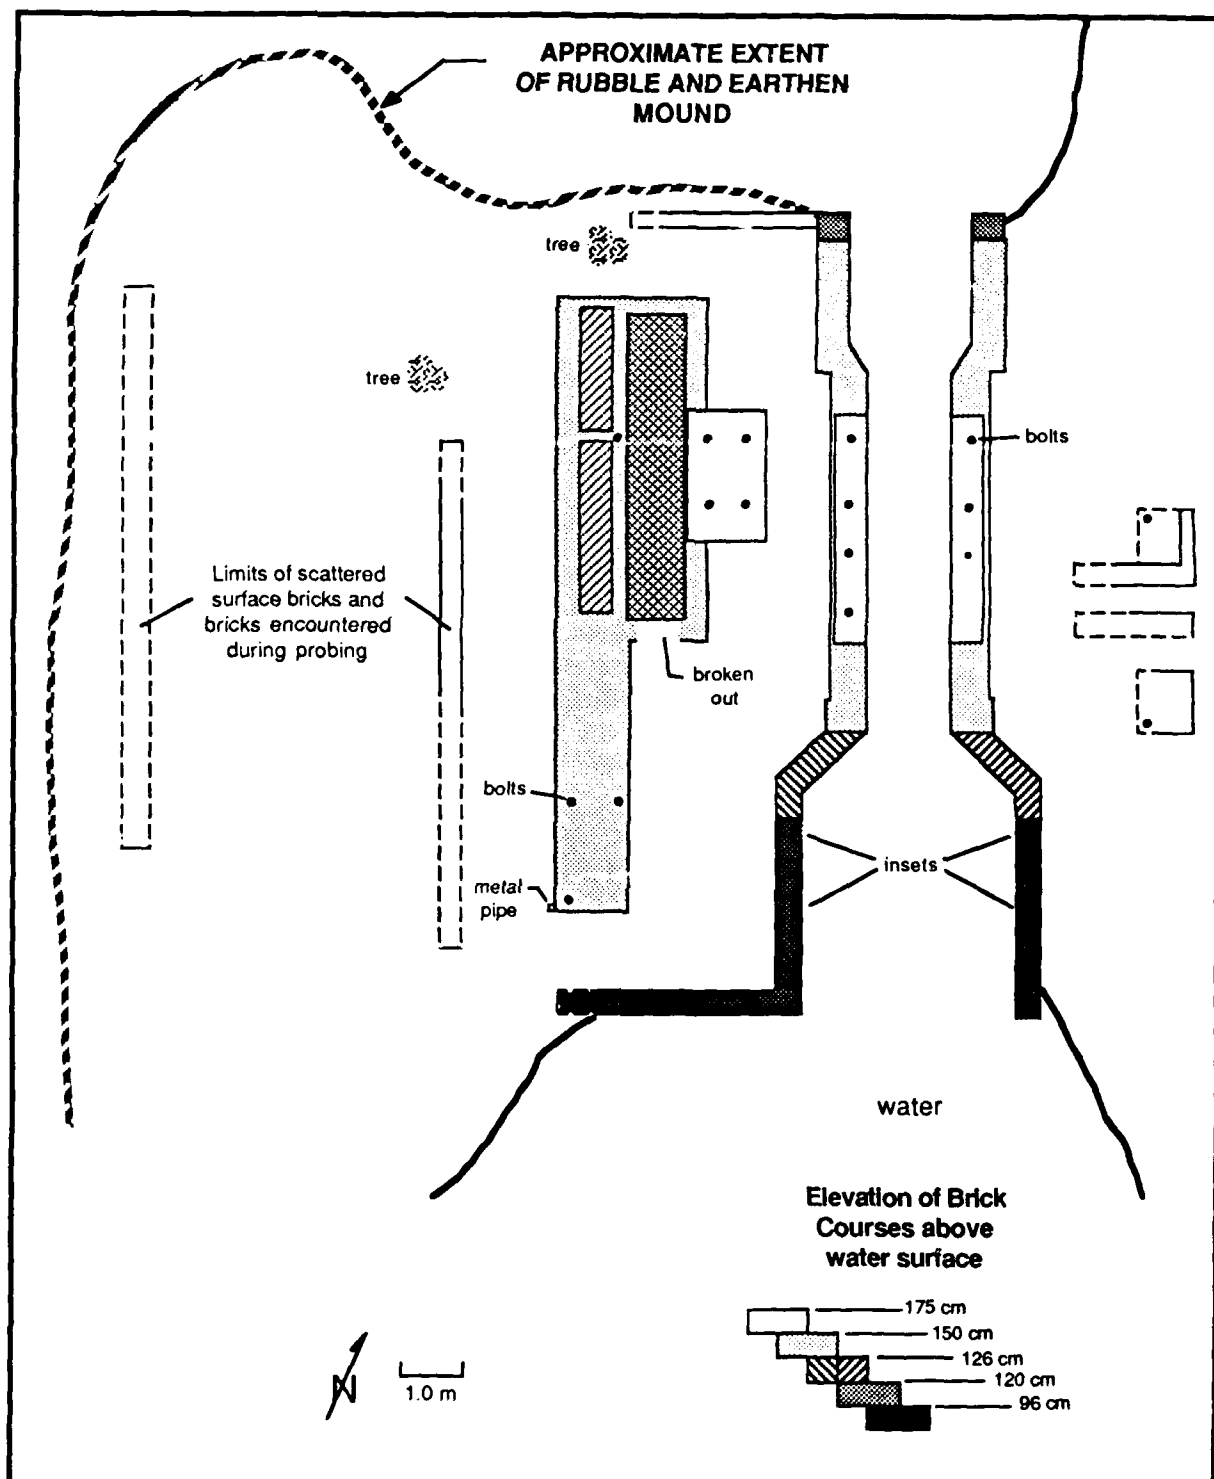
Plan view of the foundation remains of Fairview Plantation drainage machine.
